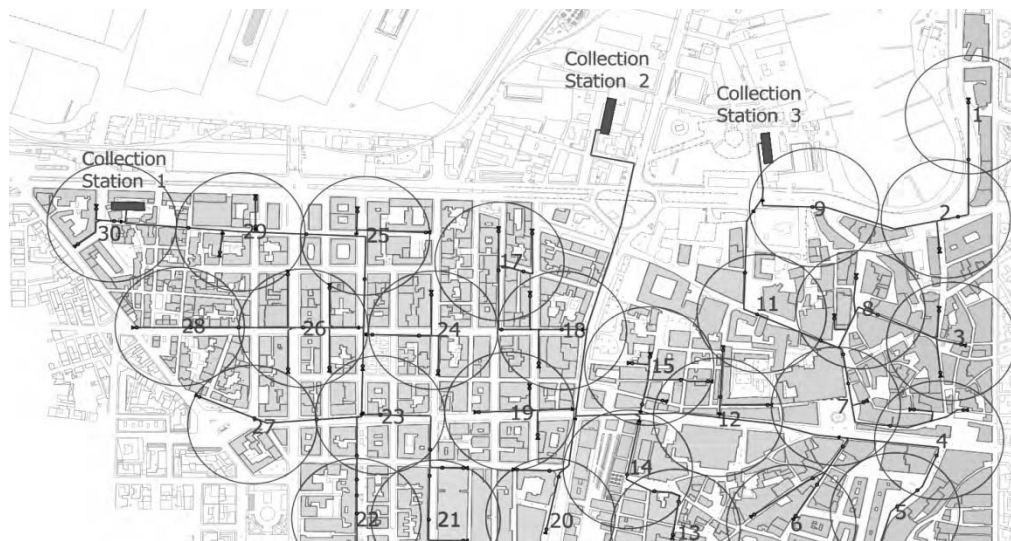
From the planimetry representing waste automatic aspiration plant (inlet points, pipes, and collection stations). Planimetry by Elvira Nicolini in collaboration with Envac Iberia SA
